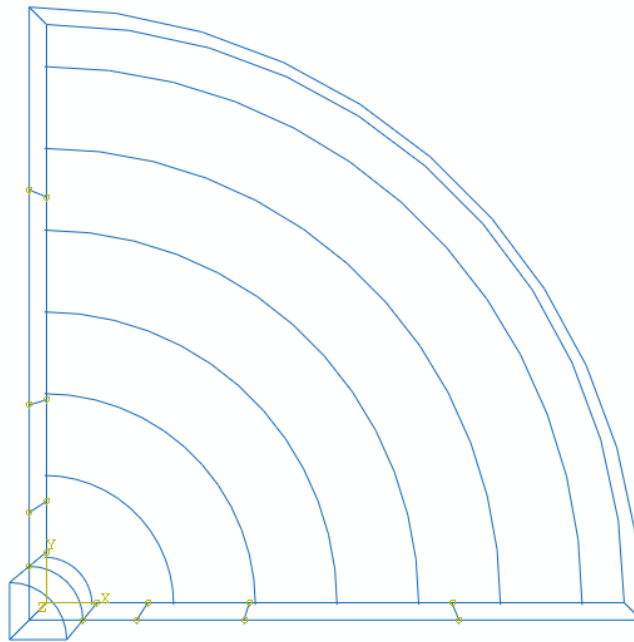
Overview of one-fourth slab (IB15a) with ring reinforcement
